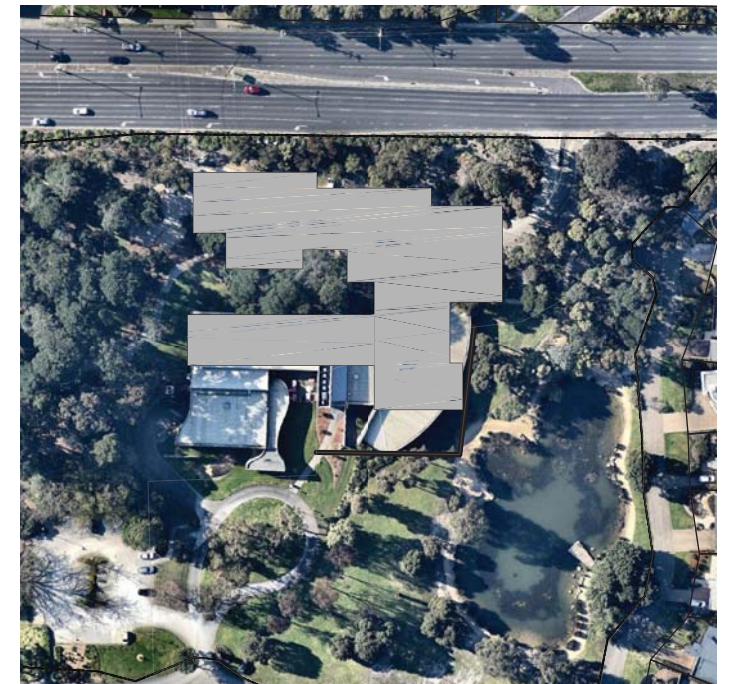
| PROPOSED BUILDING FOOTPRINT
